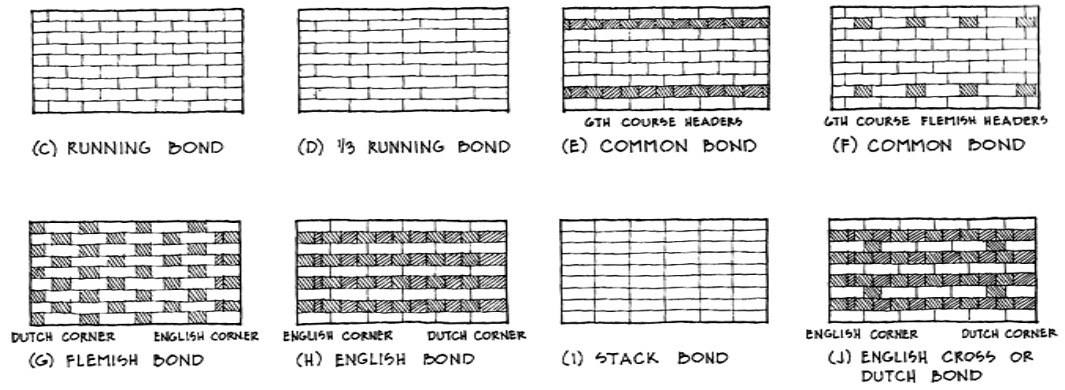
Brick masonry patterns (Beall, 1987: 358)
